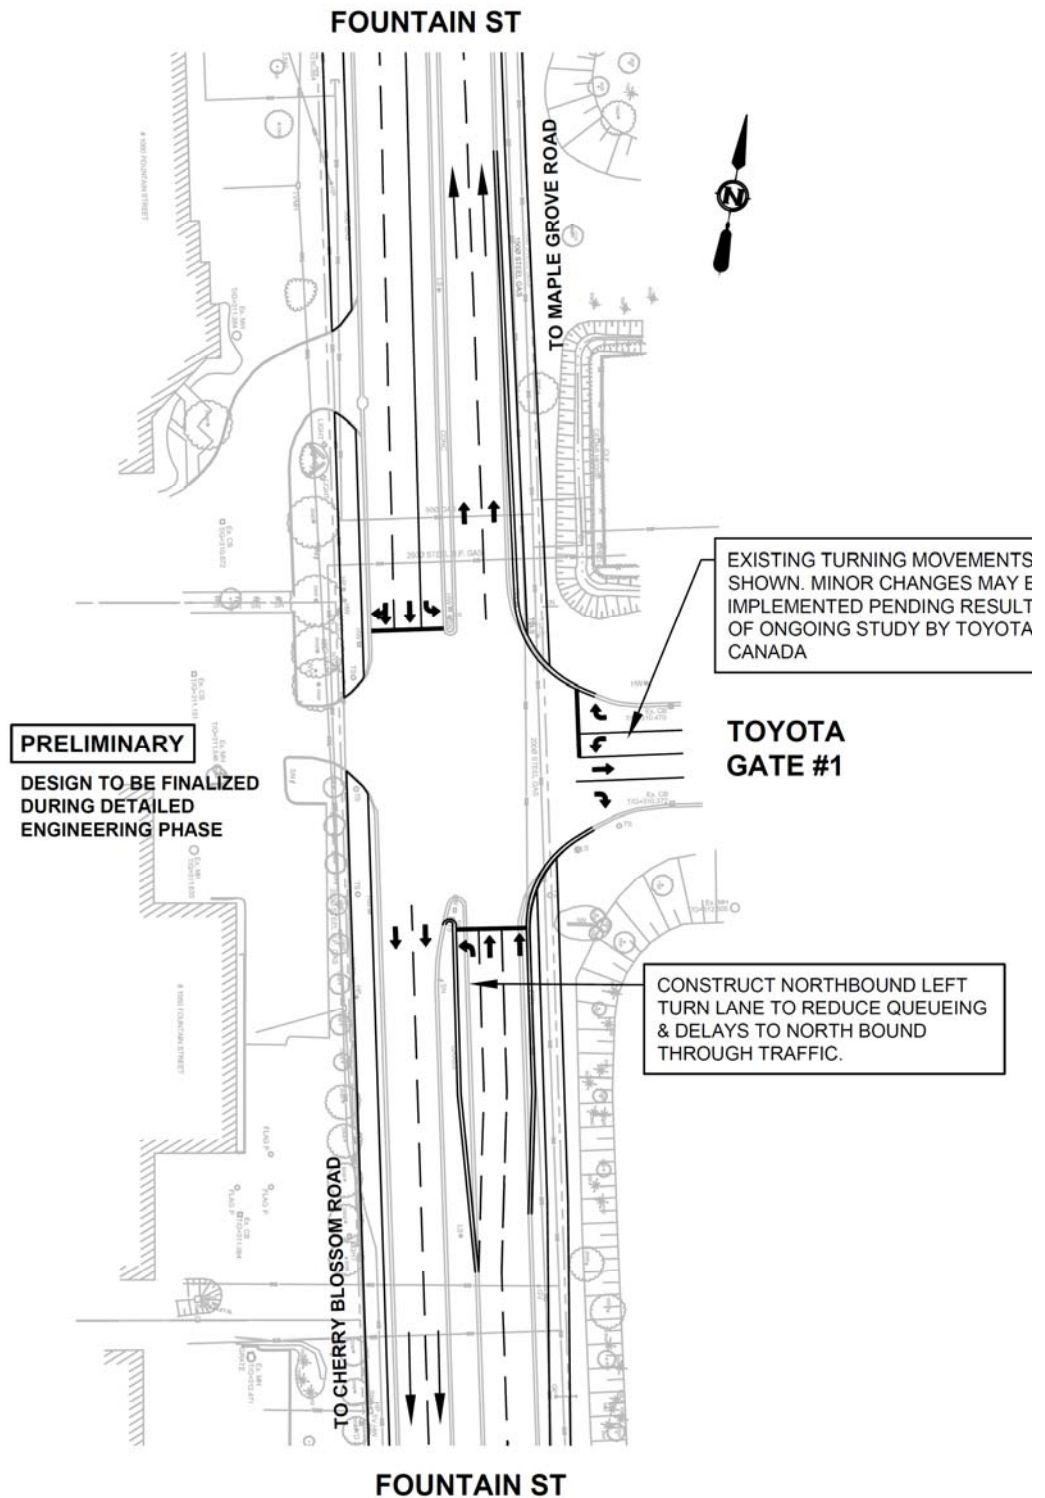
Proposed Improvements at Toyota Gate #1 and Proposed Adjustments to Median Configuration on Fountain Street from Cherry Blossom Road to Maple Grove Road
